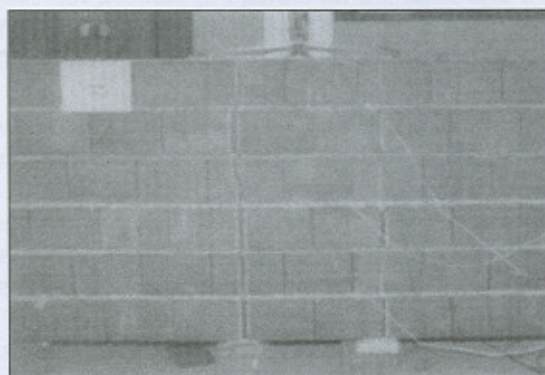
DCW Wall after testing where it is possible to see cracking and failure lines.
